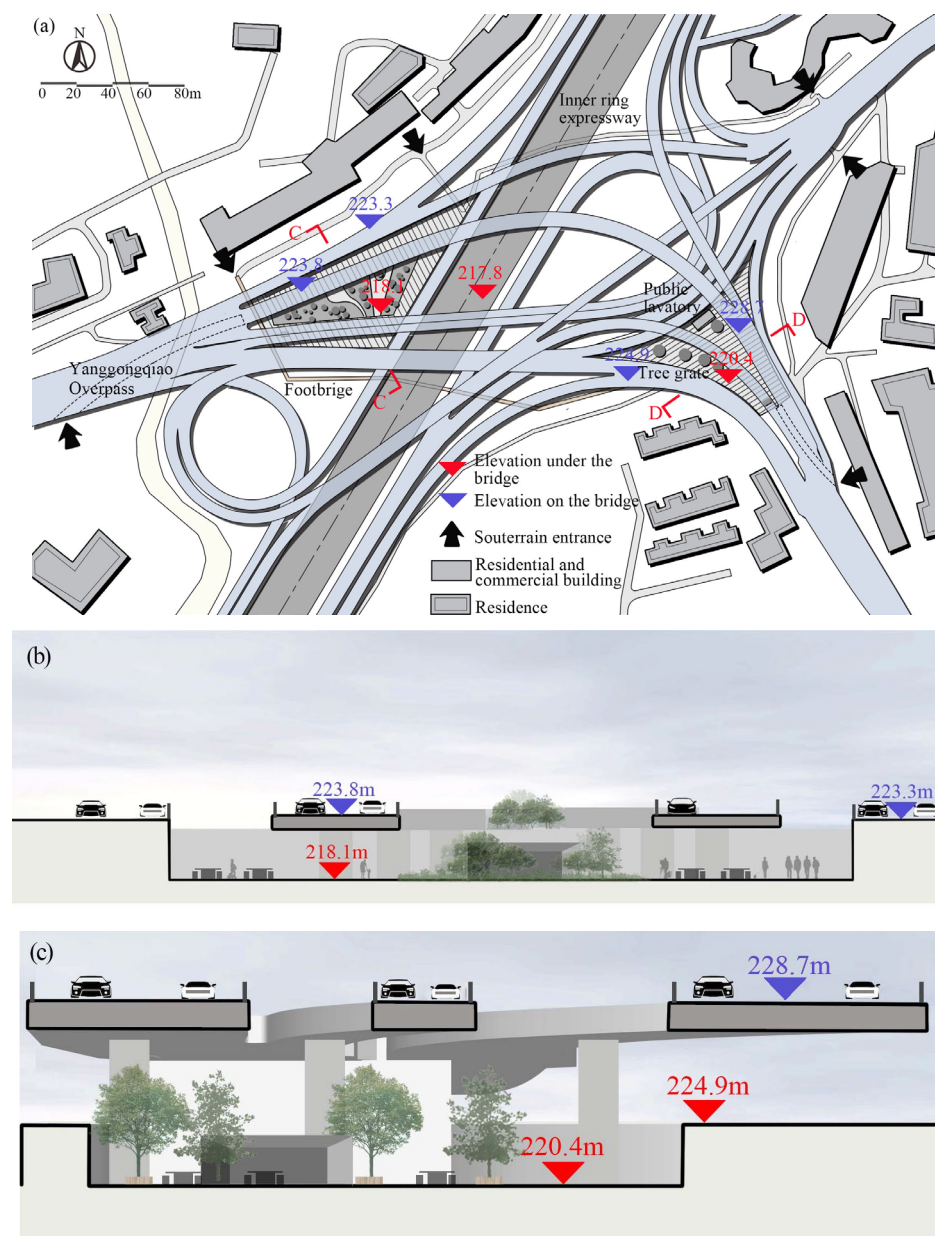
The plan and section of E'gongyan Park: (a) Plan, (b) B-B Section.
